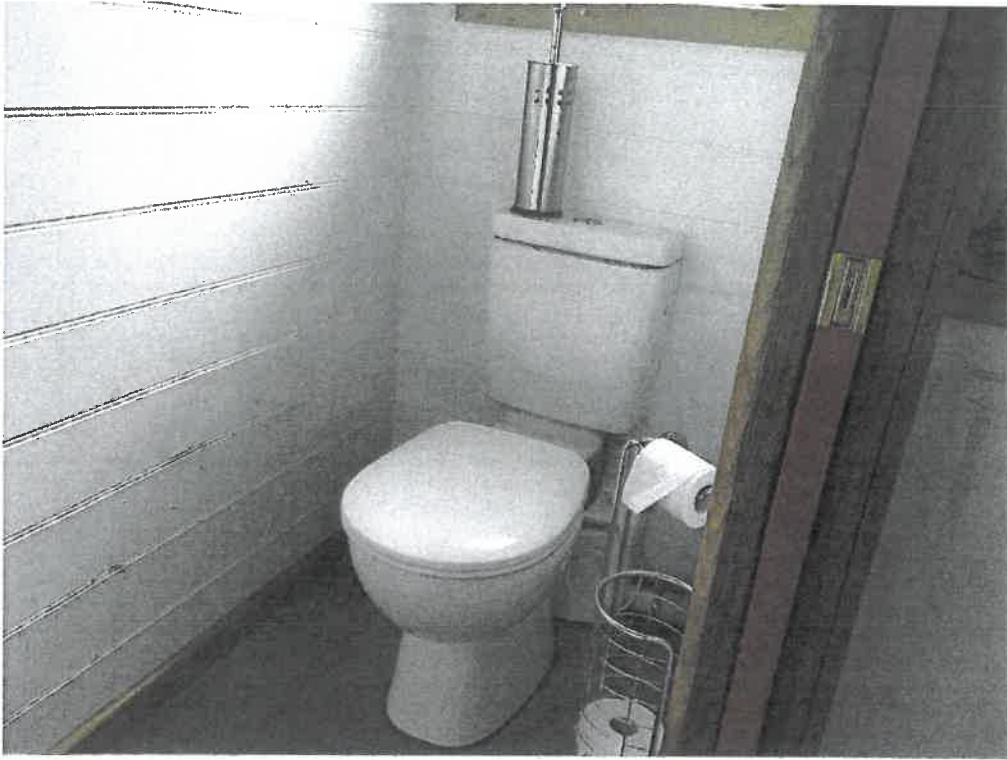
Willatook-Warrong Road Warrong 3282 sec137b report
